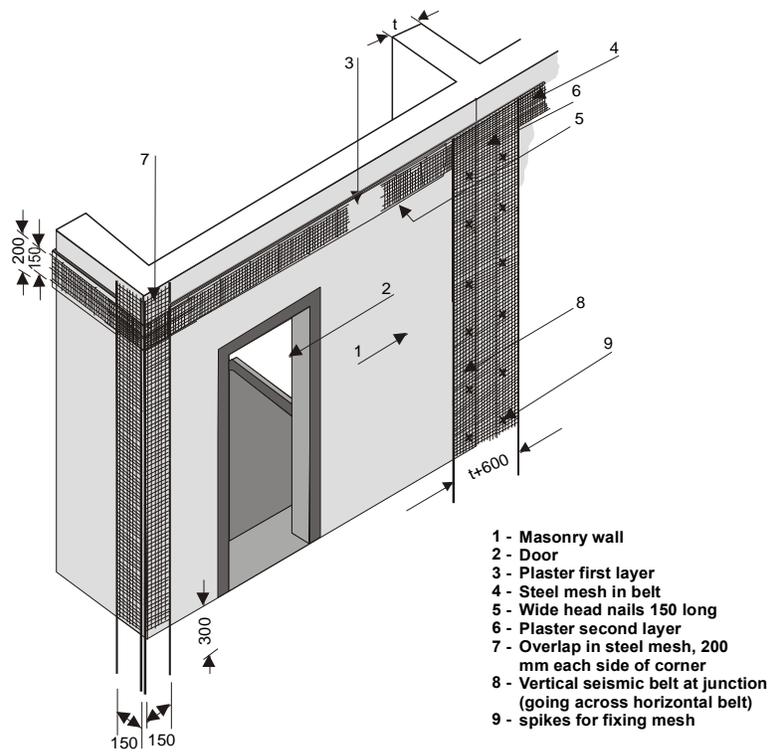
Splint and bandage technique of retrofitting of unreinforced masonry wall (Bothara et al, 2002)
